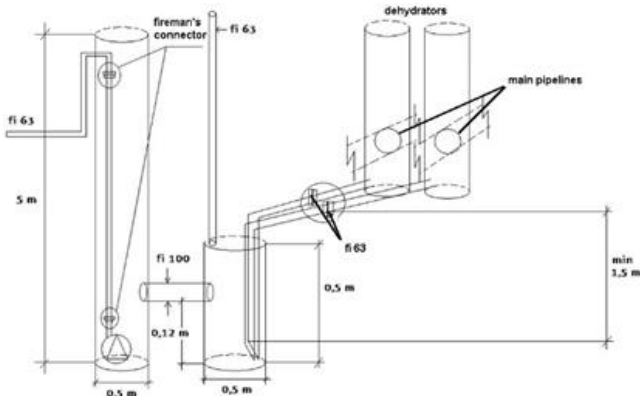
Construction of a drainage well for the main gas pipelines (13)
